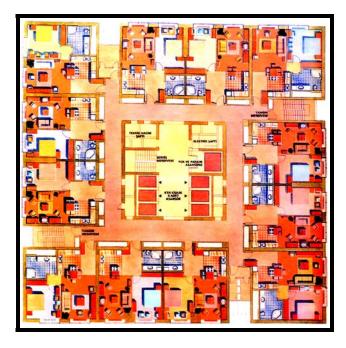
A Typical Floor Plan of Polat Tower Residence in İstanbul⁸⁶
